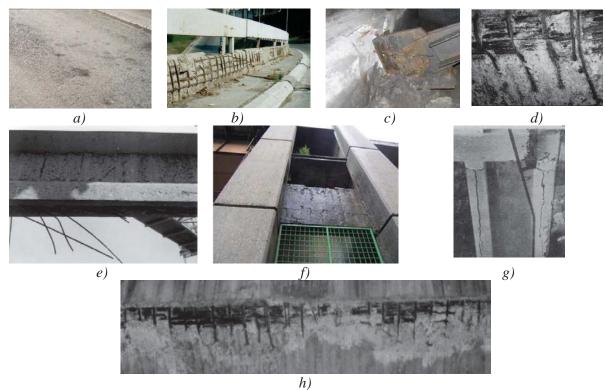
Degradation of concrete, reinforcement and prestressing cables [10, 11]
